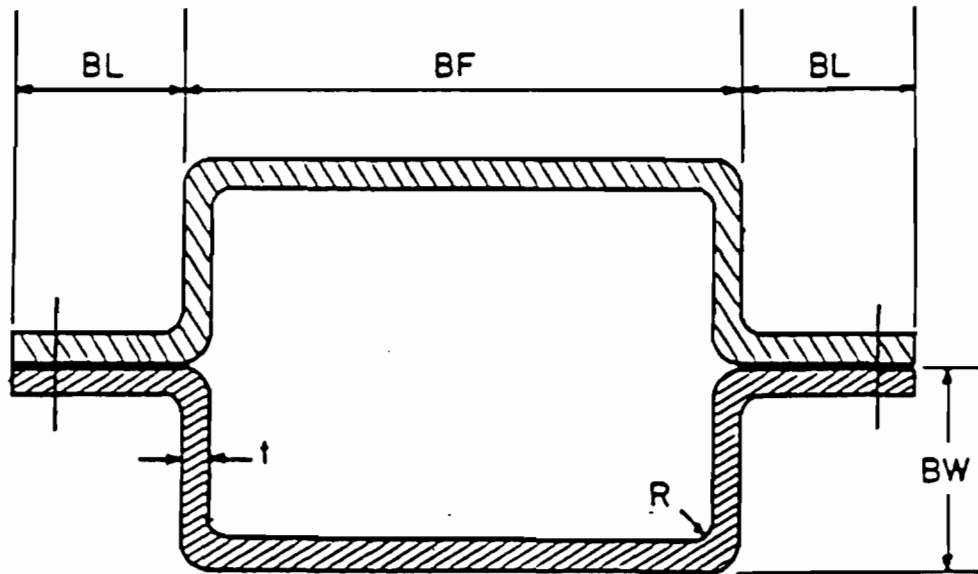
Cross Section of Box-Shaped Stub Columns Used for the Study of Stiffened Elements
